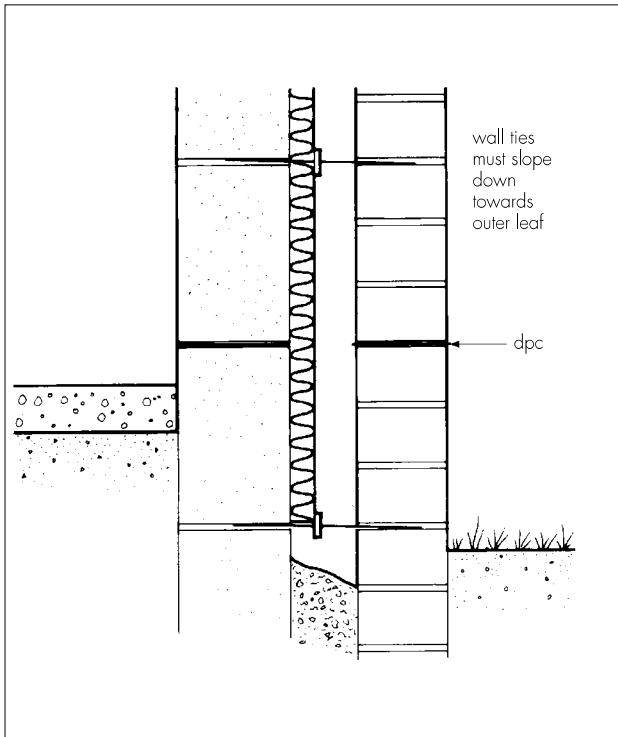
Installation of Kingspan Thermawall TW50 Zero ODP
